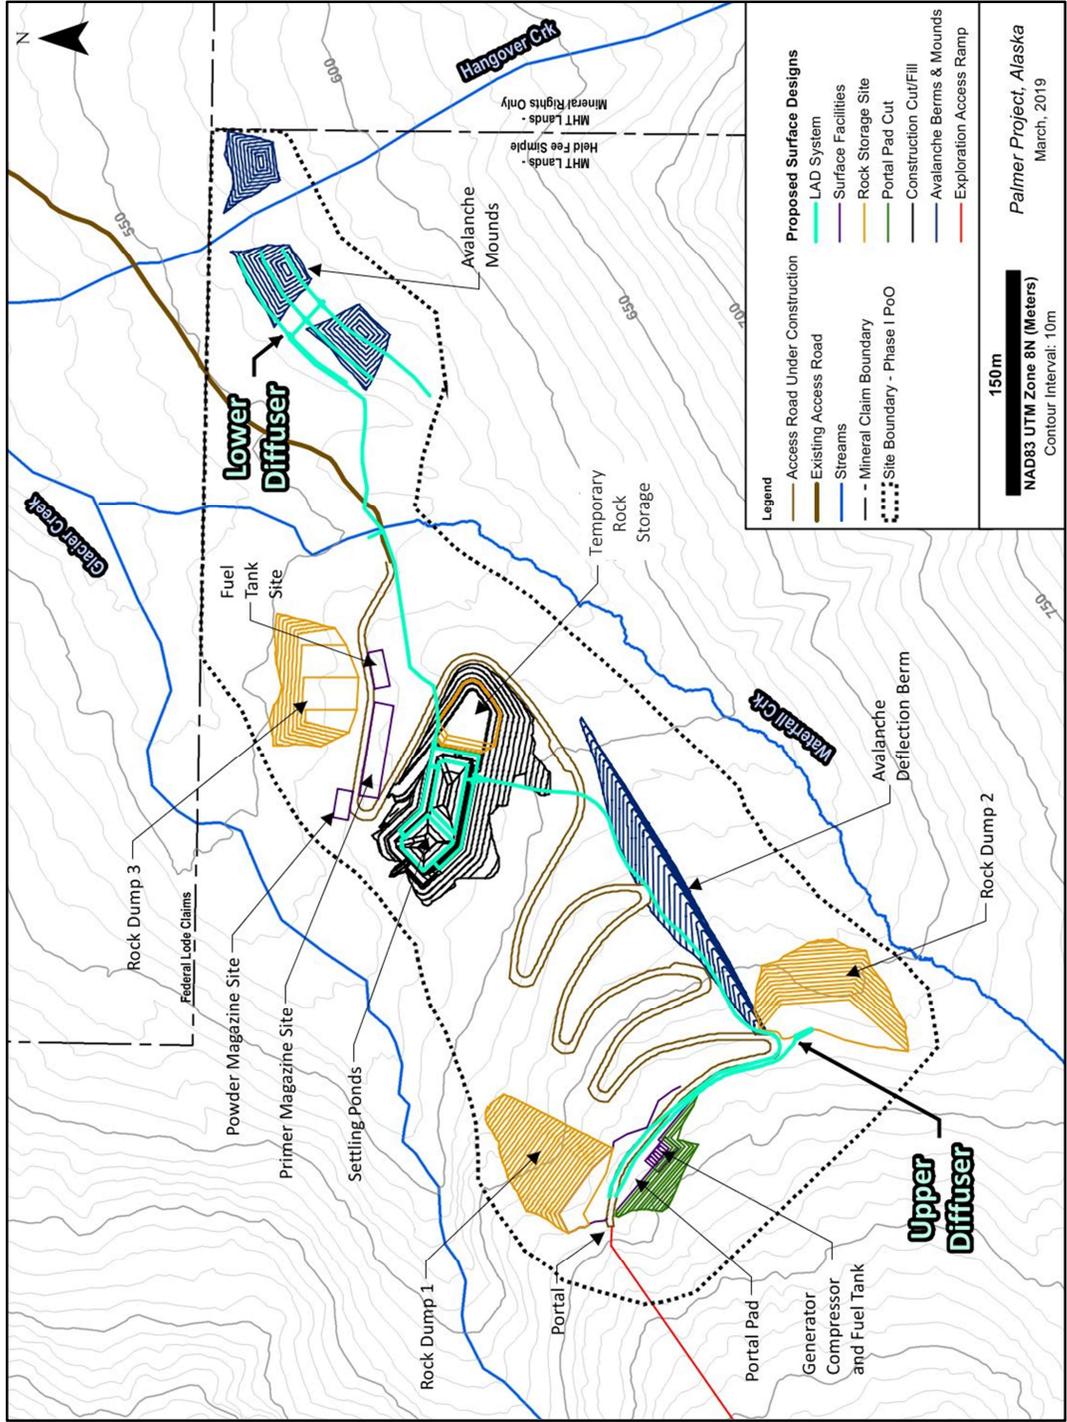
Surface Facility Layout – Palmer Project – Emphasis on LAD System
